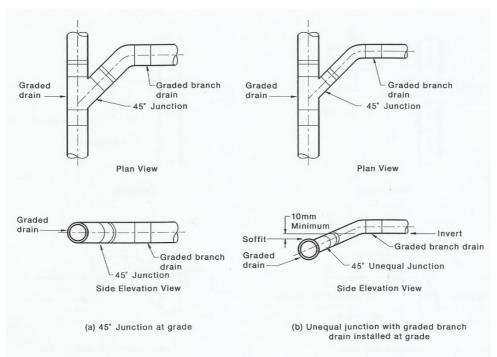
Typical arrangement for graded branch drains entering main drain
